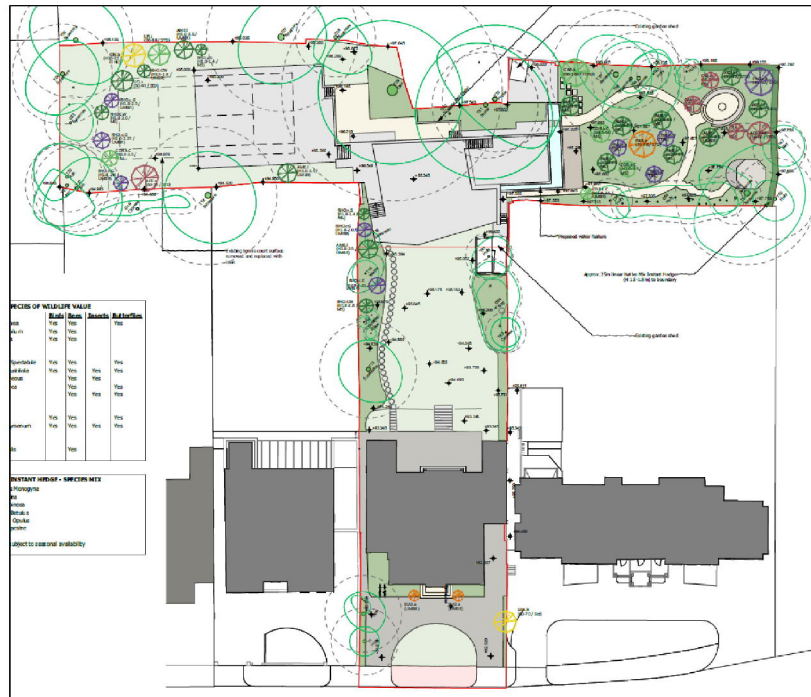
Consented Landscaping Plan – ref:2021/5768/P
